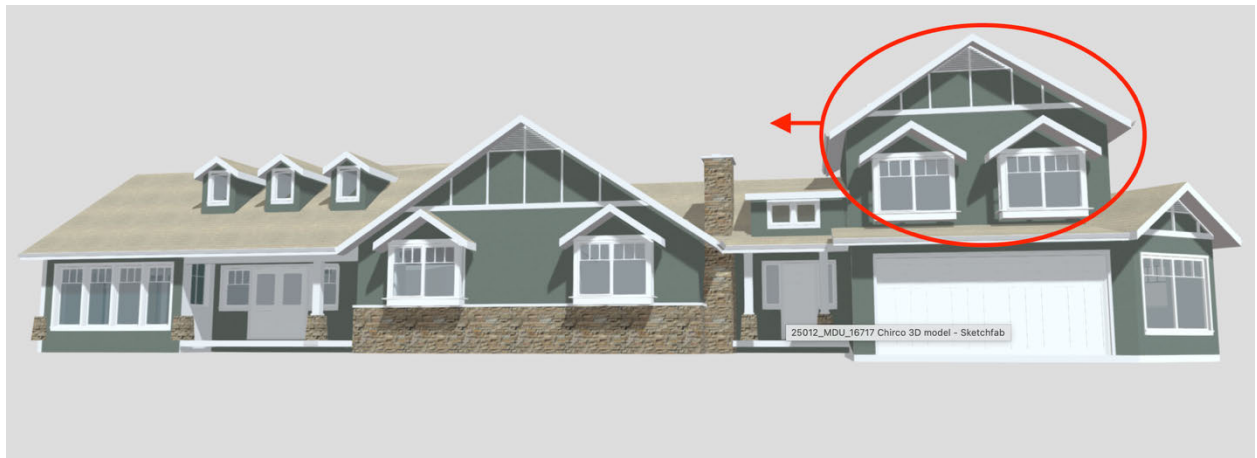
Proposal to construct the second story unit adjacent to the existing house.
